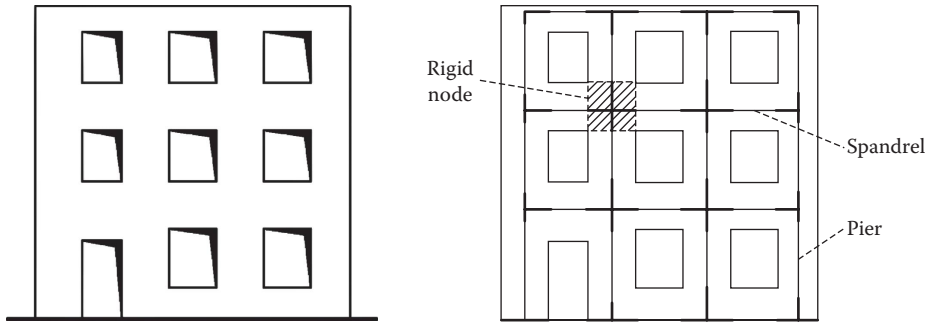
Example of a masonry façade and its 'equivalent' frame.
